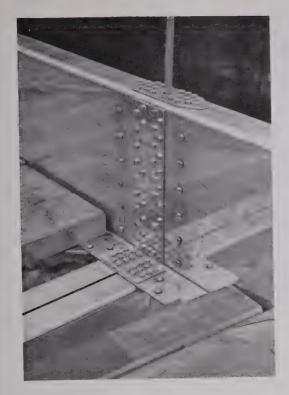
Schwand Bridge: Inside view of the stiffening girder joint
